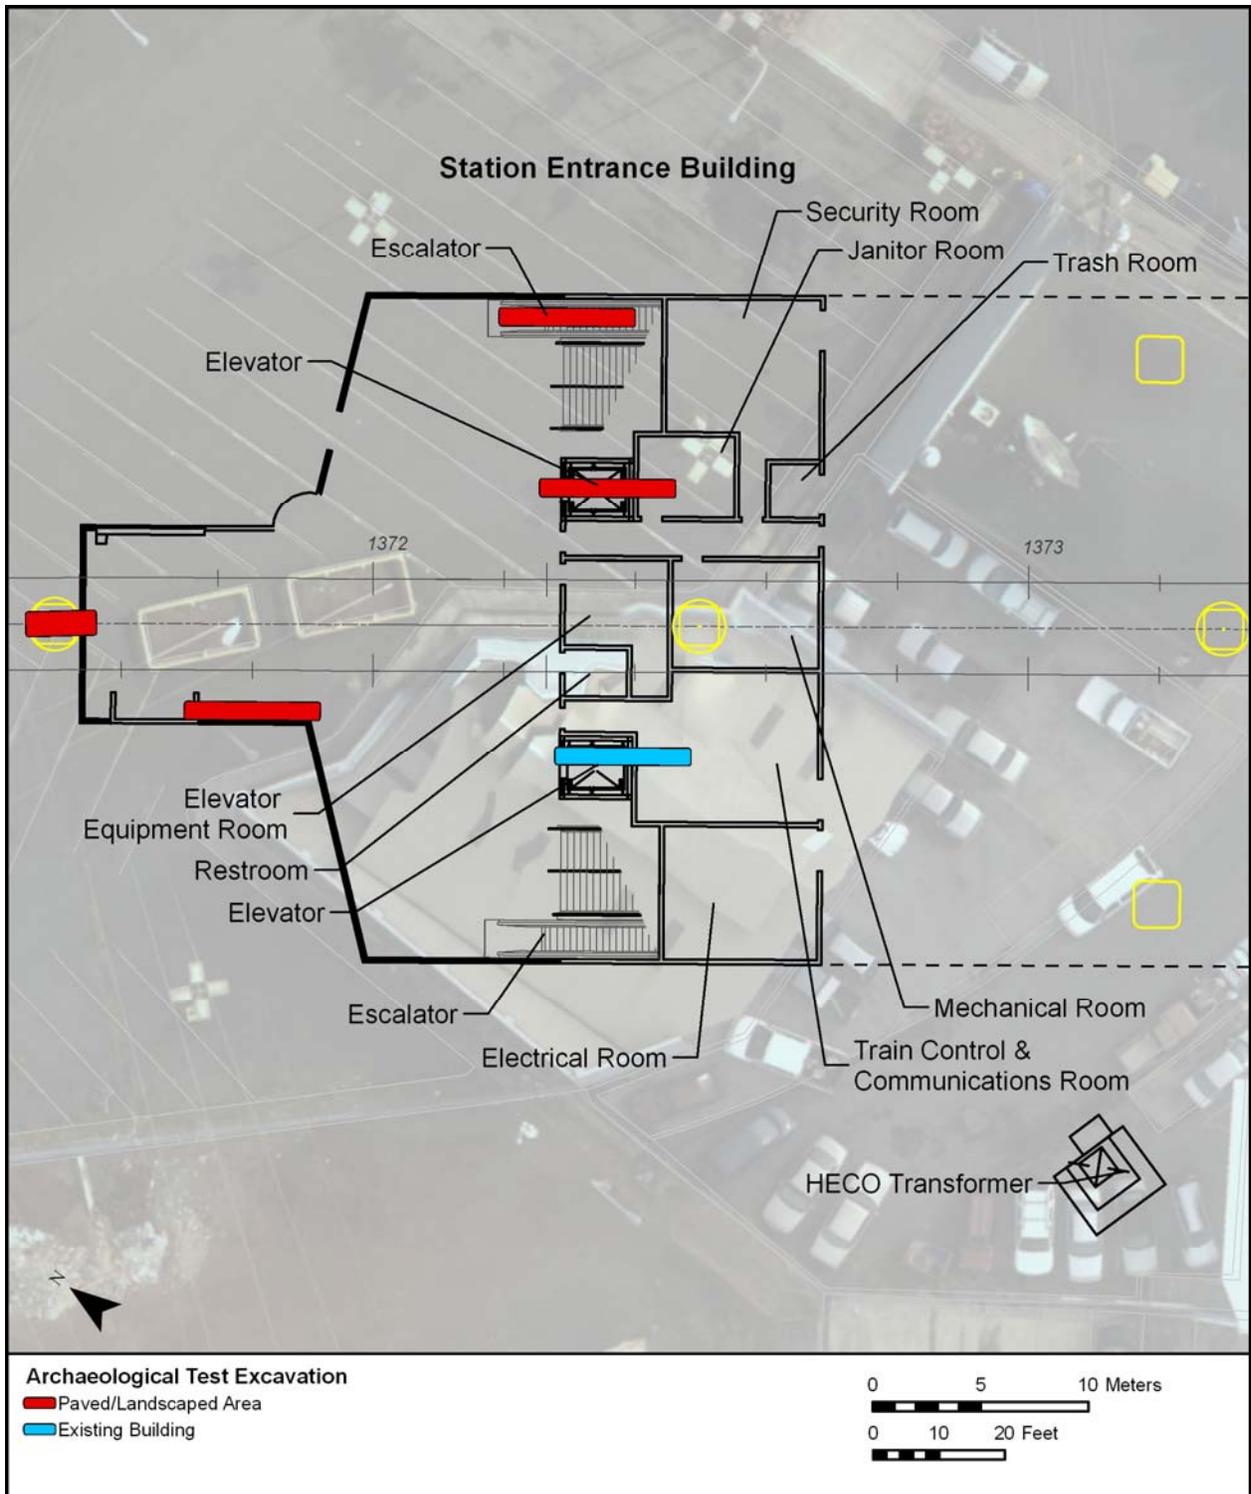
Iwilei Station, detail of Station Entrance Building showing proposed locations for archaeological inventory survey testing (four 2' by 20' test trenches at Station Entrance Building)
